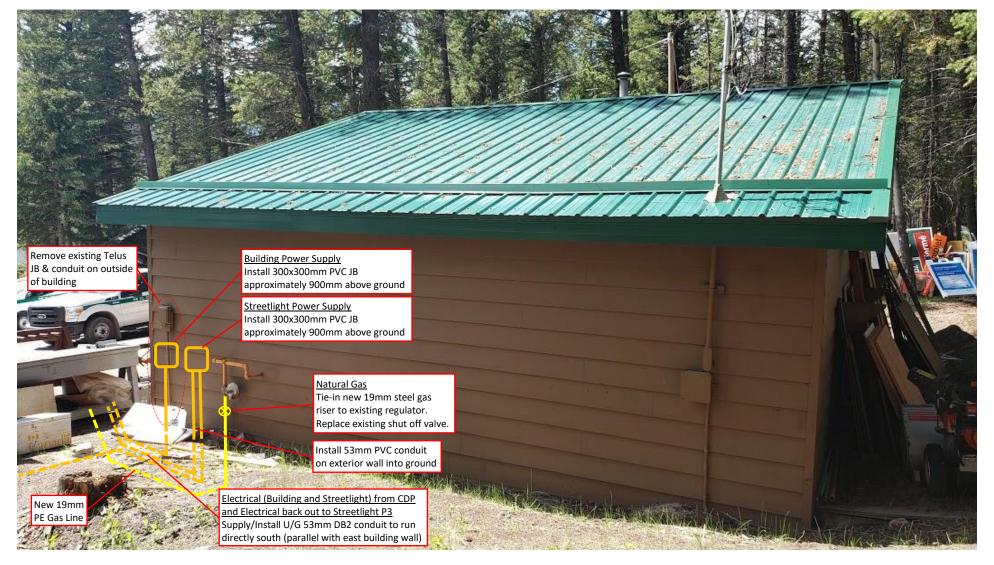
Garage A Utility Tie-In Details (East Side of Building)
